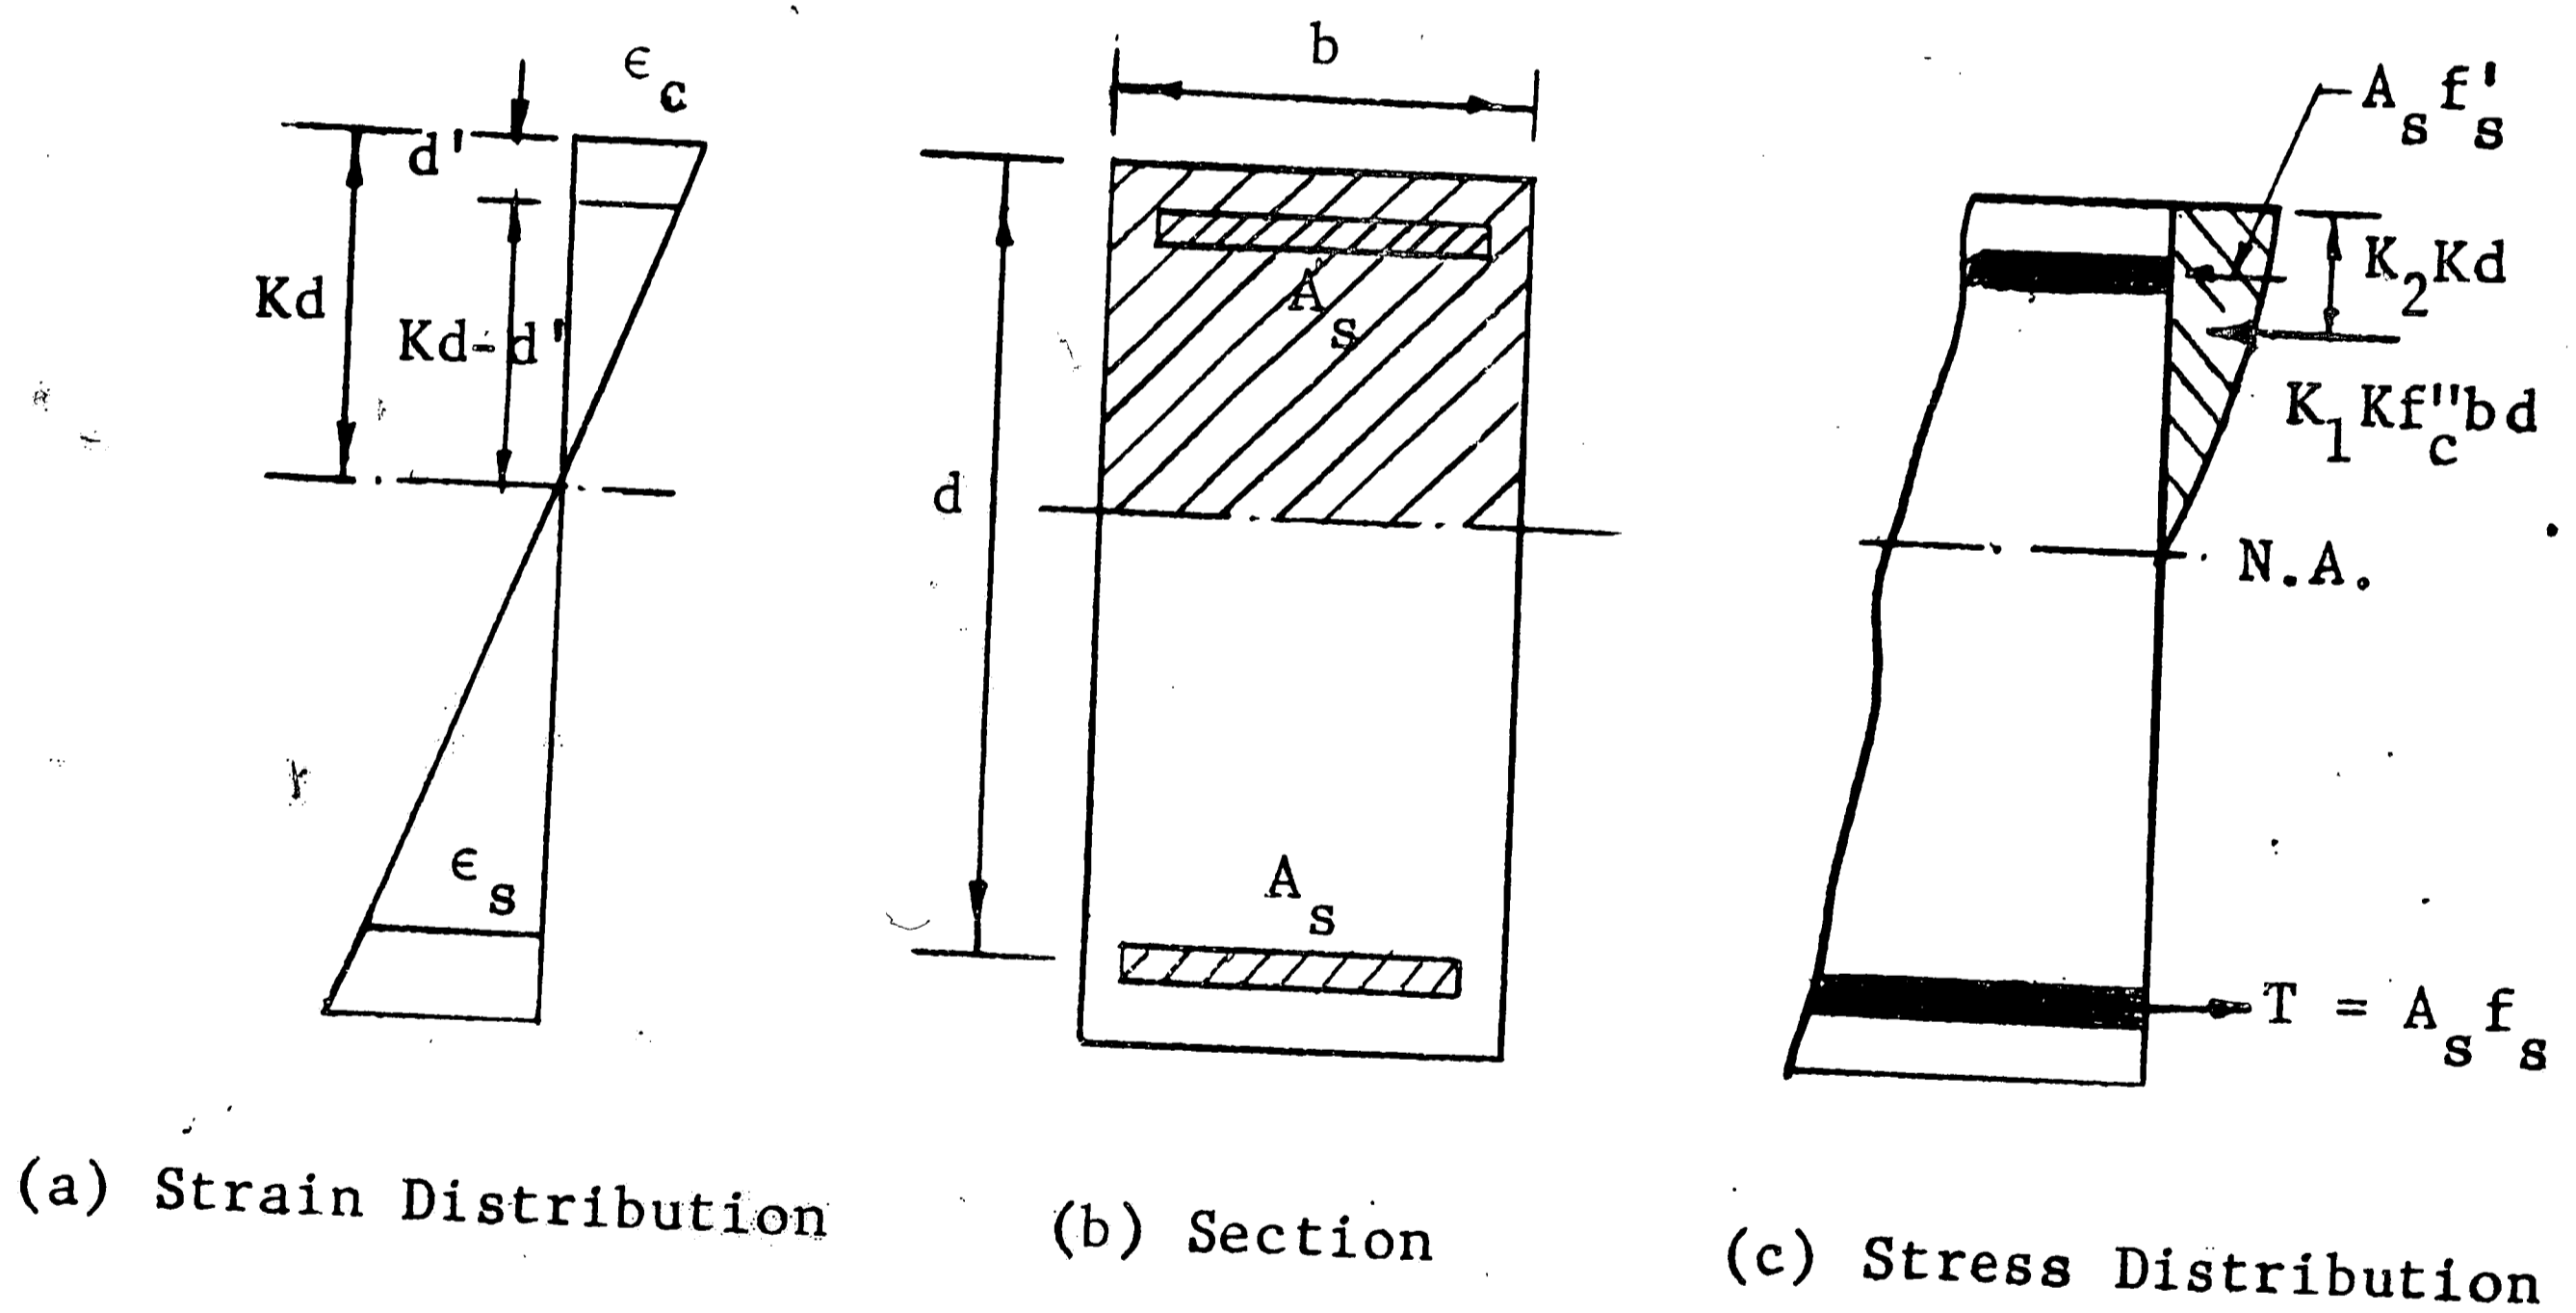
RECTANGULAR BEAM WITH COMPRESSION REINFORCEMENTS
